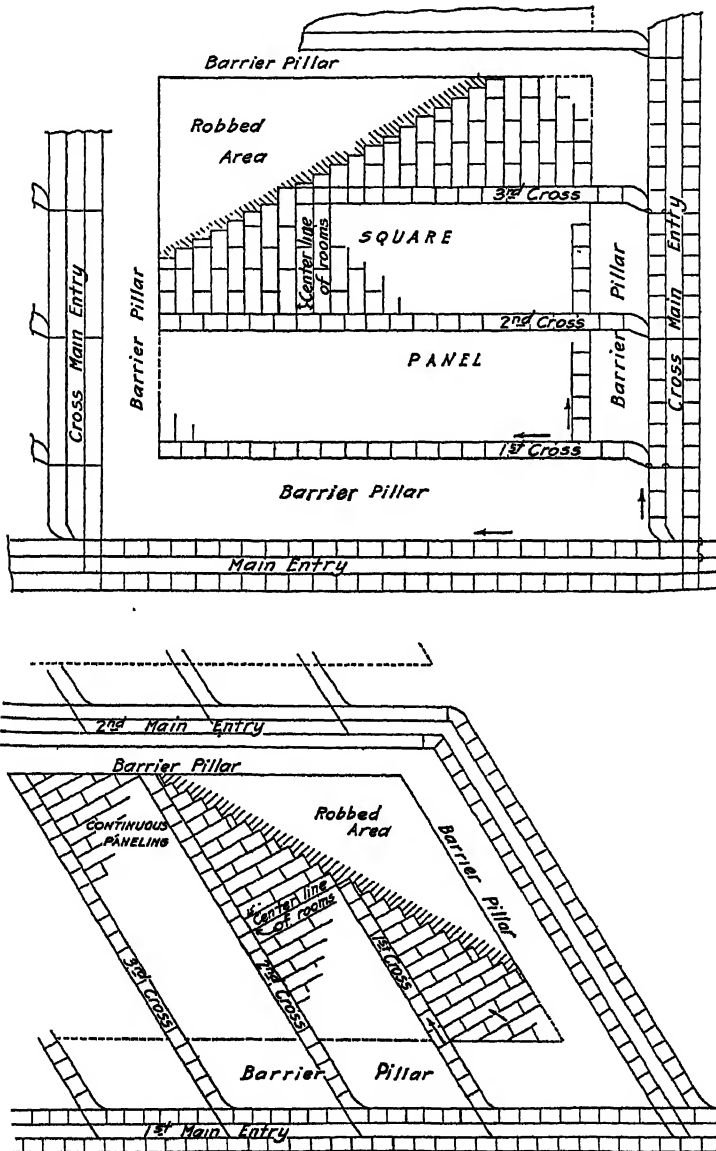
TWO TYPICAL PLANS FOR WORKING A PANEL.
